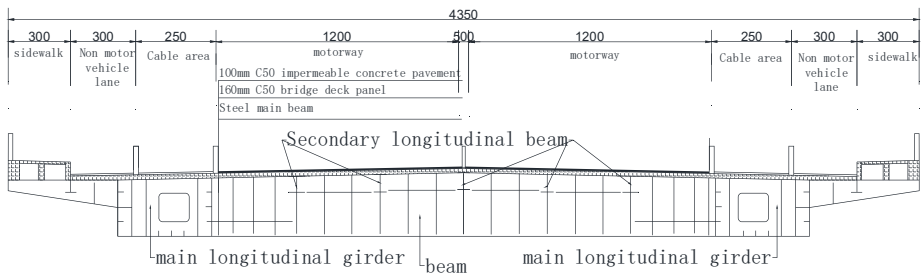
Standard Cross-Section of Steel-Concrete Composite Girder (Unit: m)
